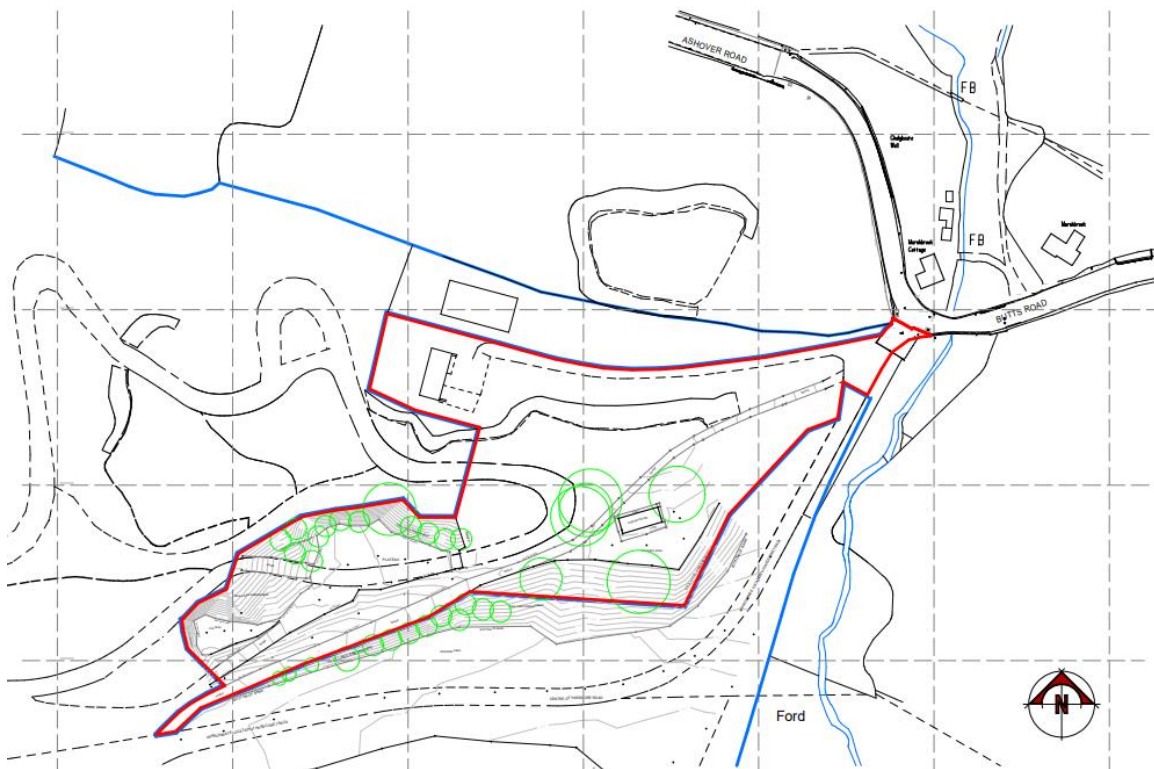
Site Location Plan, with site edged in red (other applicant owned/controlled land in blue)
